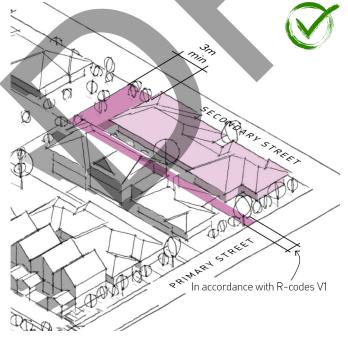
Single House and Grouped Dwellings - Lot Boundary Setback Example Diagram
